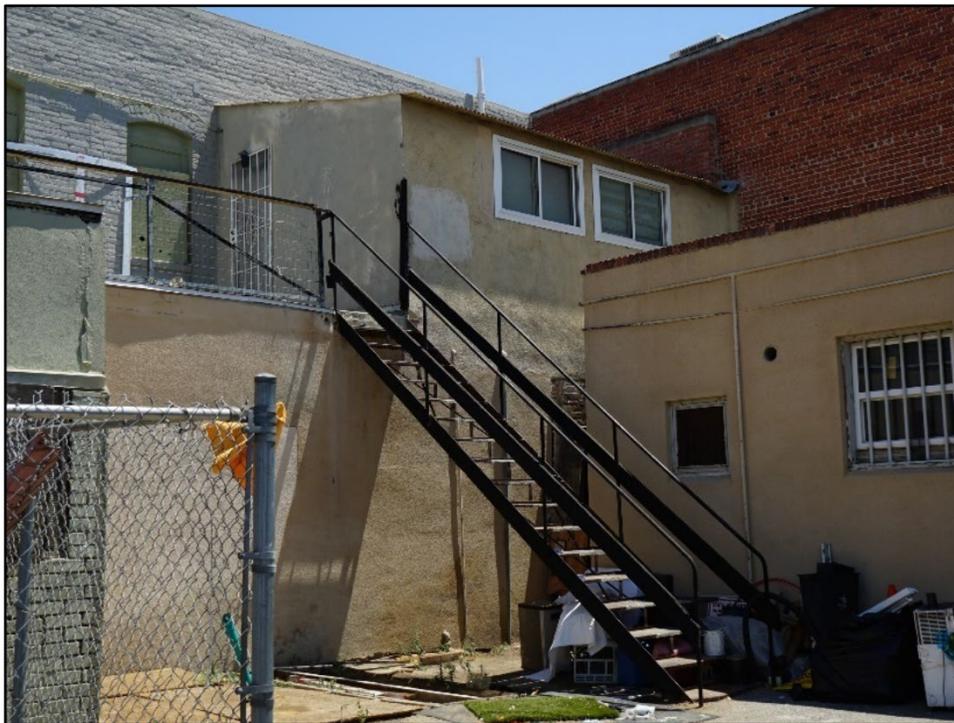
937-945 F Street, closeup of addition at southeast end of the rear (southwest) elevation. A small portion of 942 Fagan Alley is seen at right.
